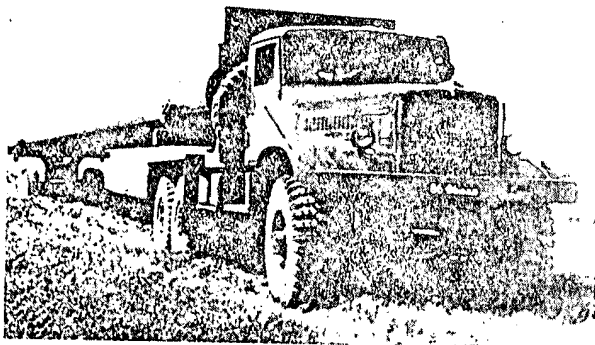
Stringing 38 m long, 1020 mm diameter triple-jointed sections
